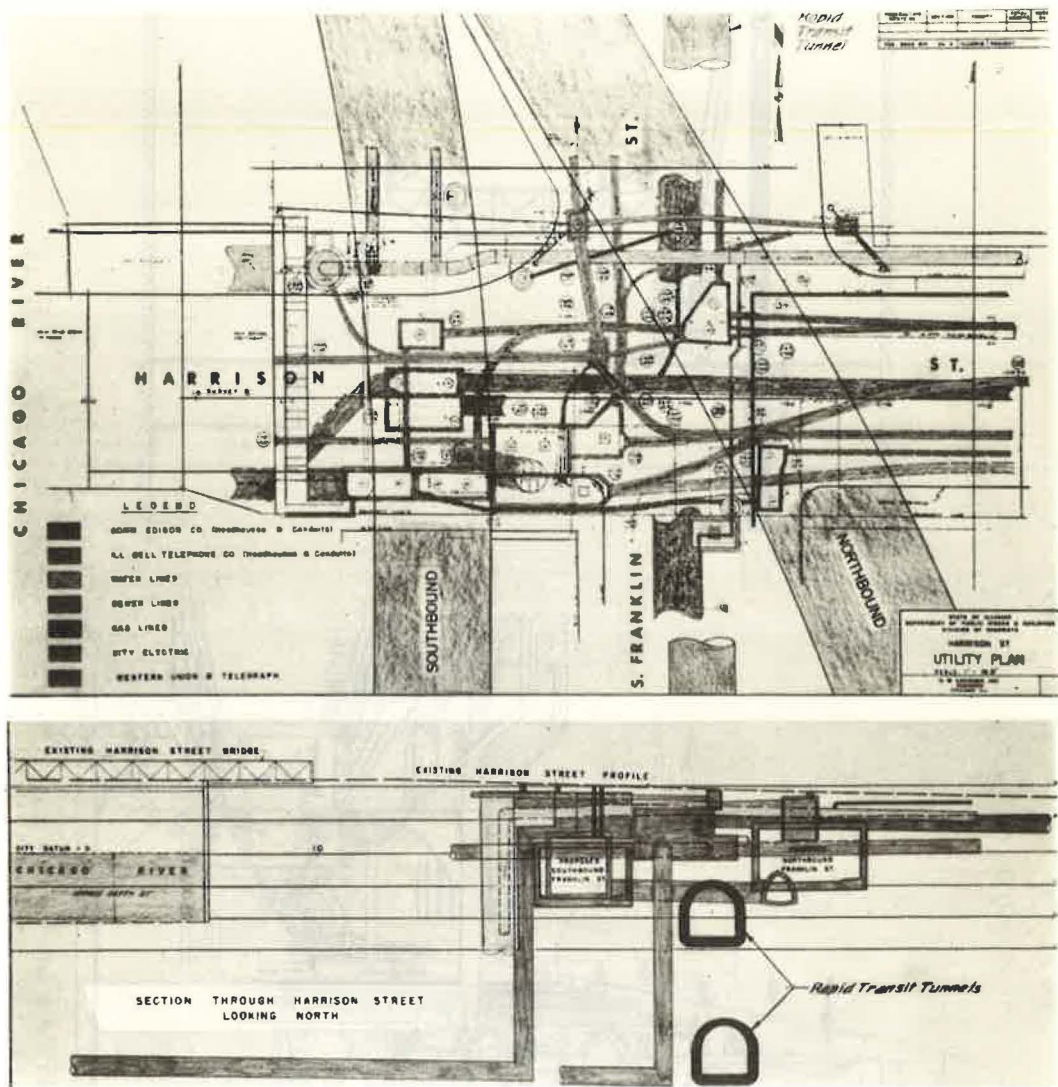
Underground utilities at Harrison and Franklin Streets—plan and profile.
